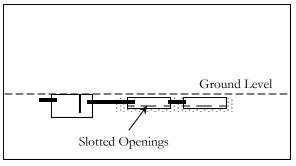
B. (Side View) Septic Tank and Precast Concrete Block-Trench System. Slotted openings along bottom of each side allow for appropriate lateral absorption. Precast blocks provide structural system stability in unstable soils and are more easily repaired/replaced than traditional leaching systems.
